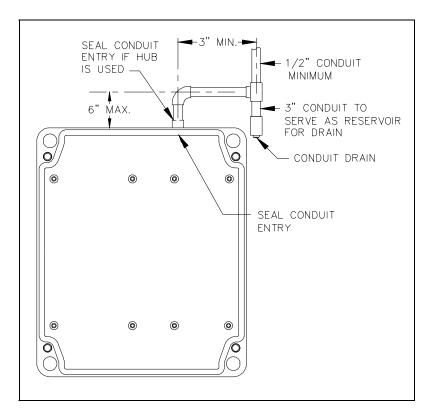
Top entry conduit installation details (NOT RECOMMENDED)
